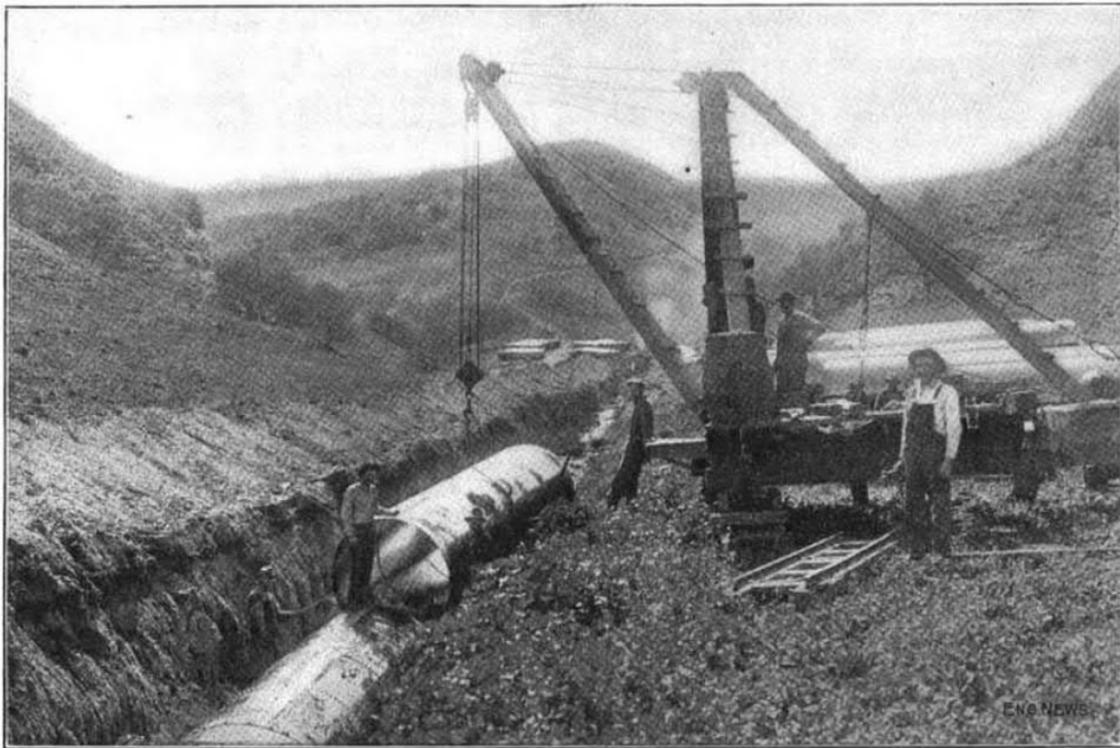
Constructing the San Fernando Siphon of the City Trunk Line (Heinly 1914:1147).
